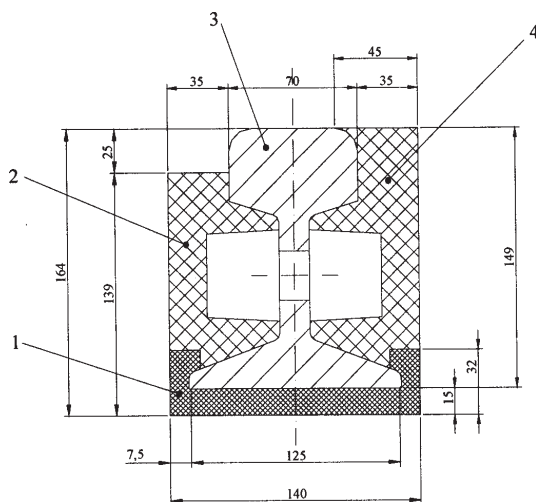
Example of tram railway: 1- Base plate; 2 - Internal damping element; 3 - Railway type 49; 4 - External damping element
